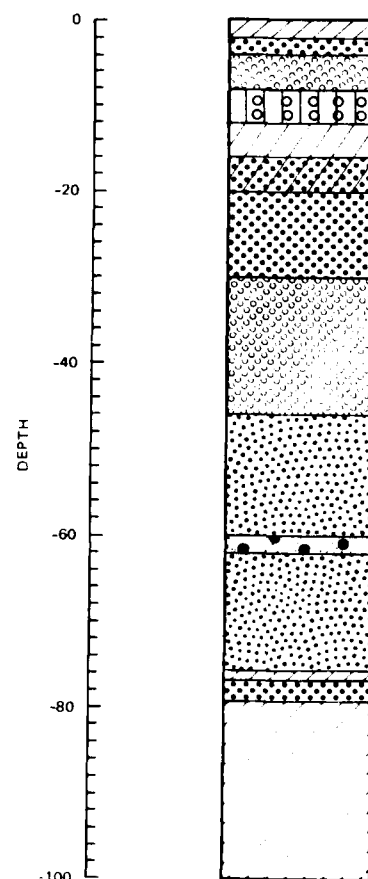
Generalized soil profile for Lock and Dam No. 3 pile test site
